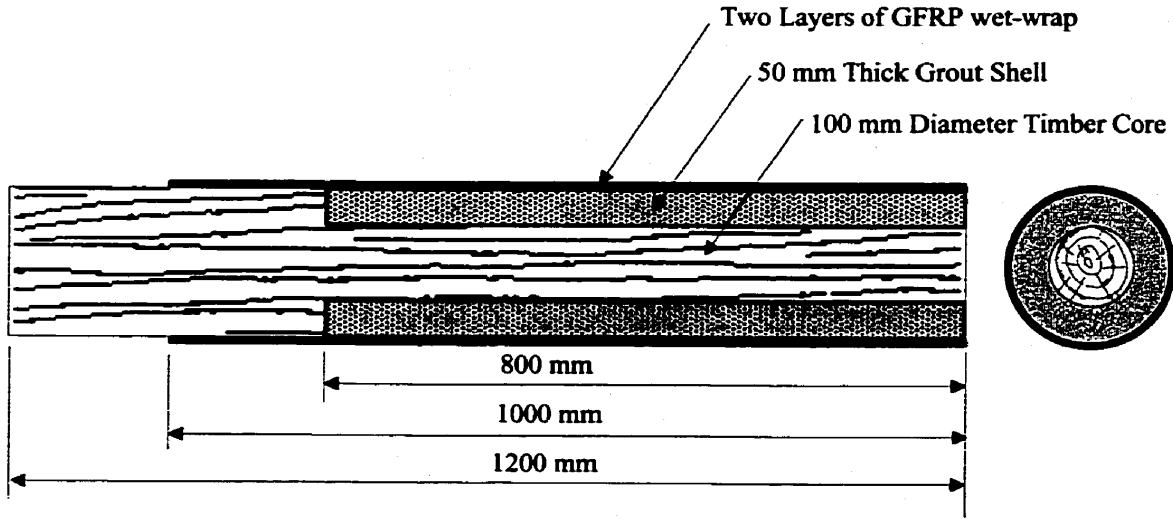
(d): Longitudinal Cross-Section of Bending Specimens Examining the Transition Zone
